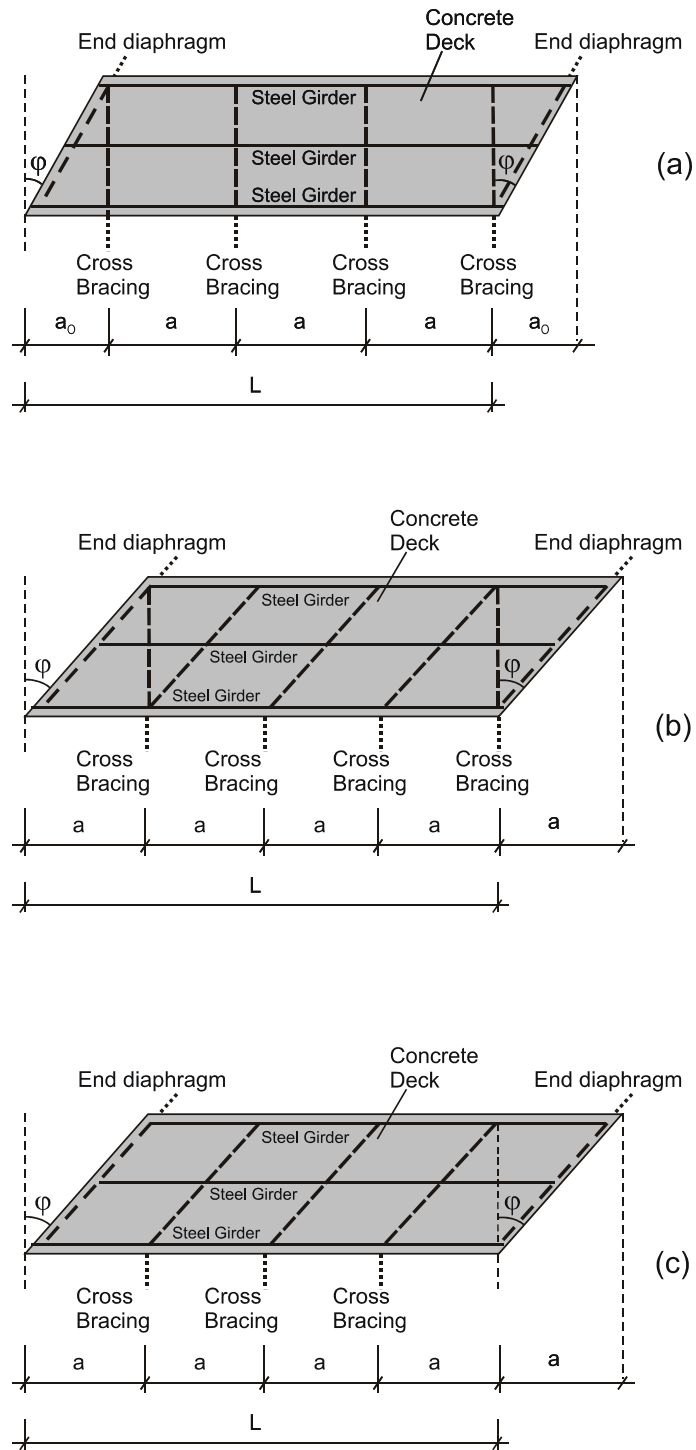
End and Cross Bracing Orientations in Skewed Bridge Decks
